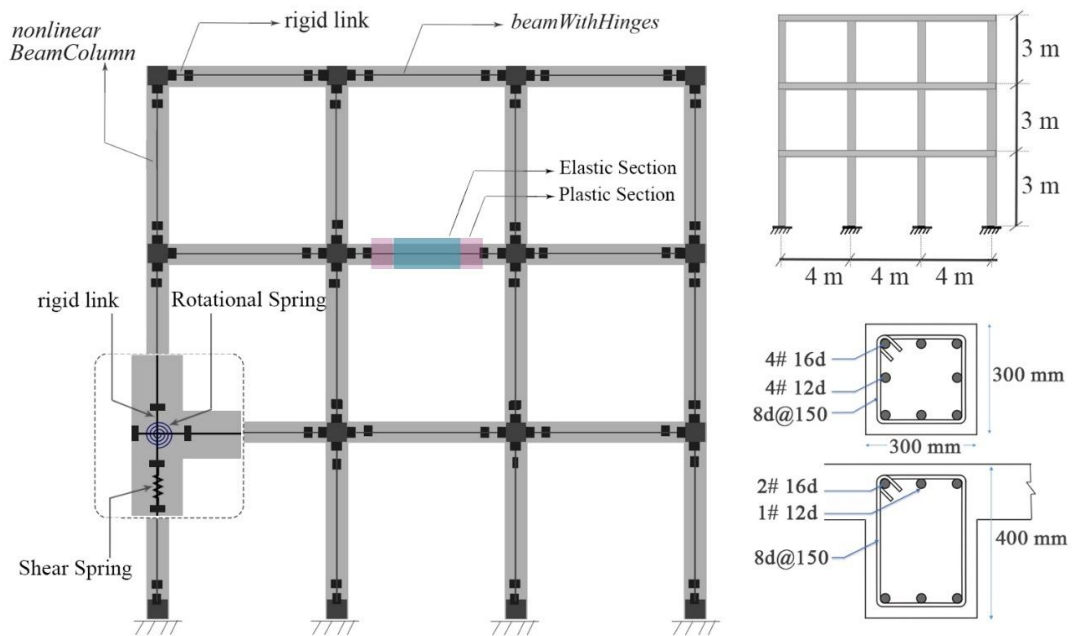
Numerical representation of case study frame with elevation, column, and beam section view
